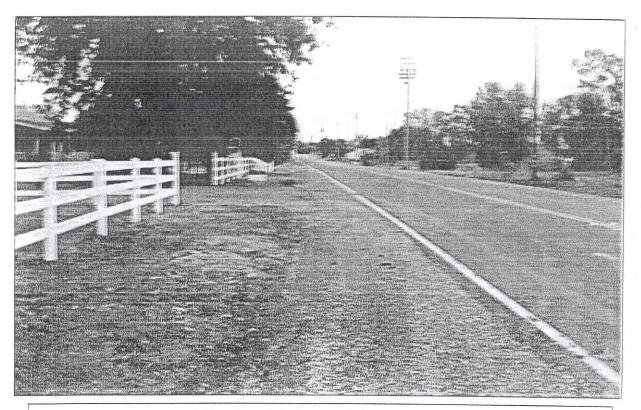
Photo C. Escalon-Bellota Road, facing south from access road to Well Site A.
